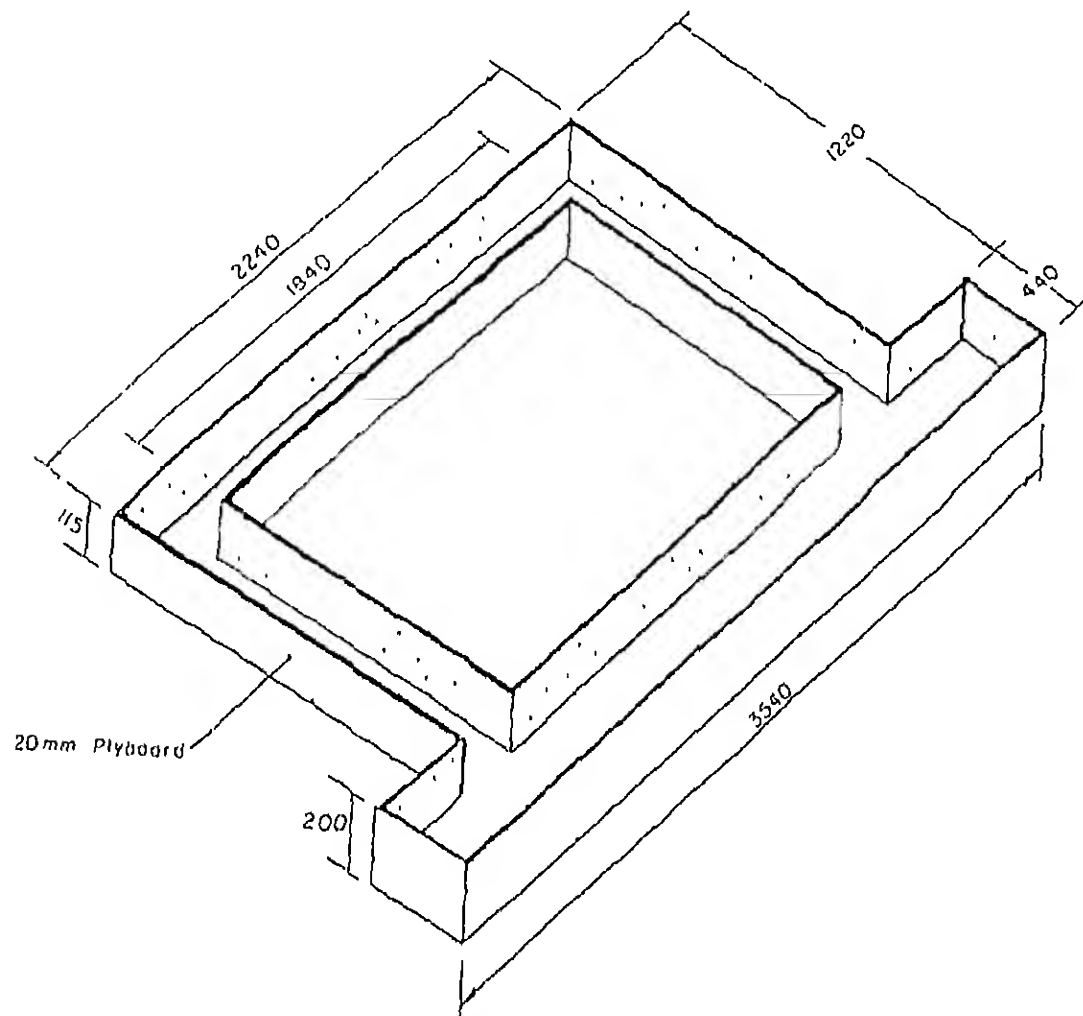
External dimensions of the wooden mould for casting the RC frame specimen. All dimensions are in mm.
